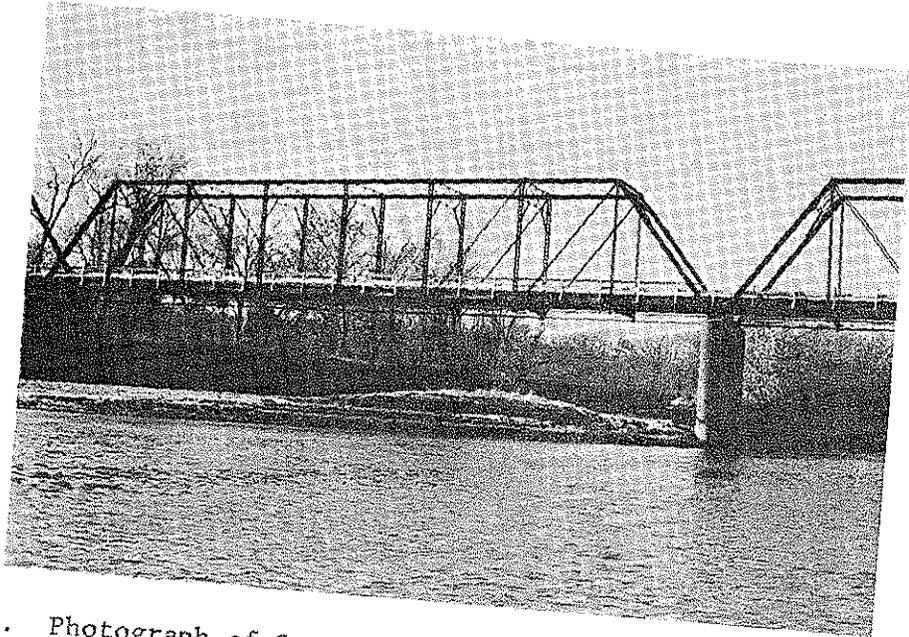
Photograph of Snyder Bridge (Polk County).
